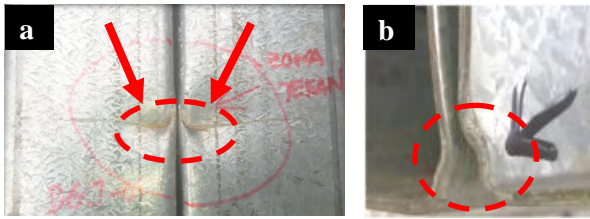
The column (a) and beam (b) failure modes at compression zone (RG-BGJ-1)
